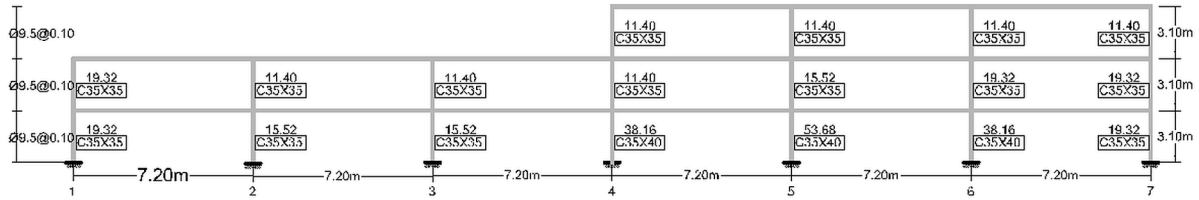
Educational facility, geometry and reinforcement in beams of Frame B = Frame E
